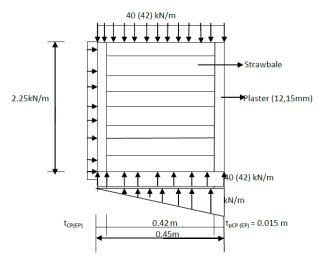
Cross section of cement (earth) plastered strawbale wall
